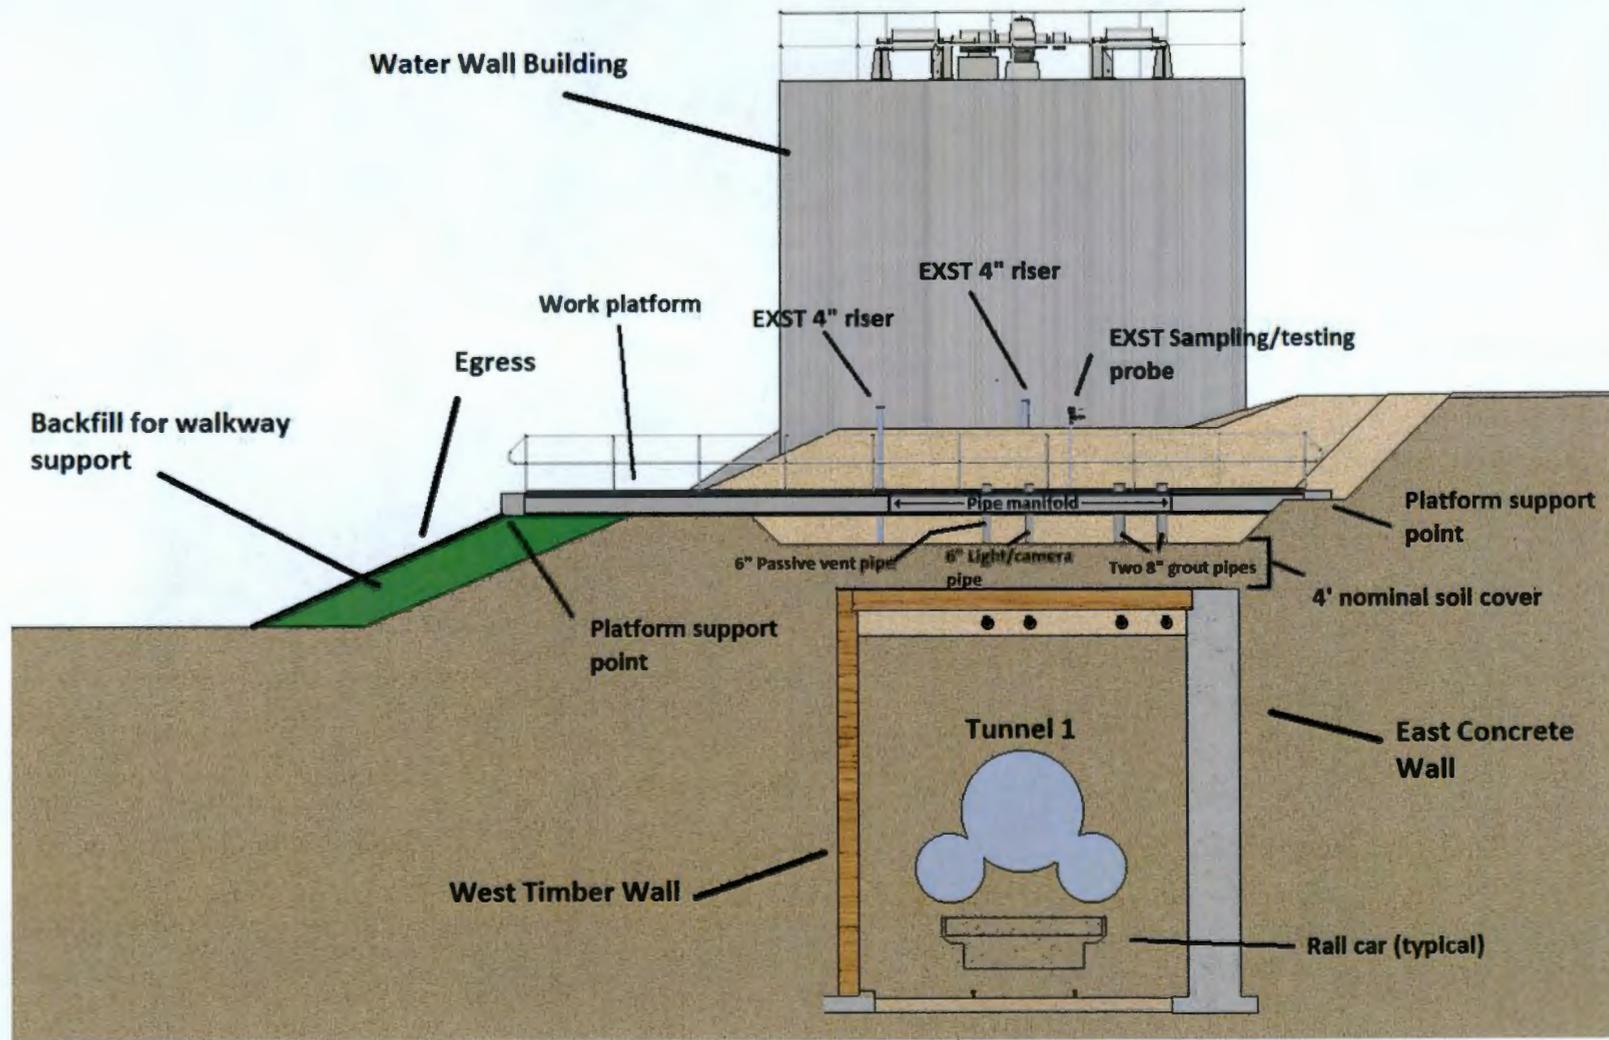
South Elevation of Tunnel Number 1 Grouting Equipment – Platform and Piping
